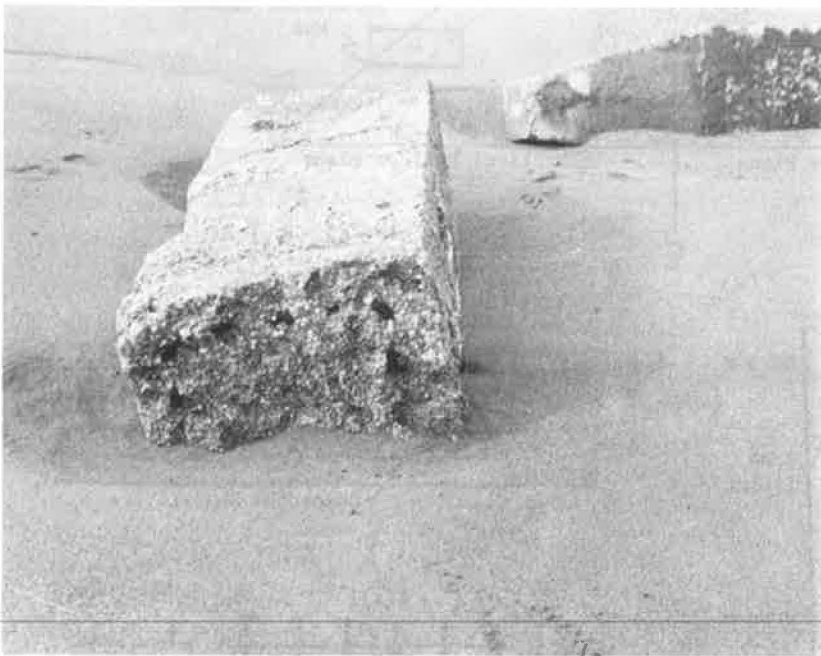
Bamboo Reinforced Concrete Wall Built in 1940 Found in Vicinity of Taichung Harbor, Taiwan, in 1976. Shows Bamboo Culm Inside the Concrete Wall Still in Excellent Condition. (Courtesy of H. C. Chiu, Taichung Harbor Construction Bureau)
